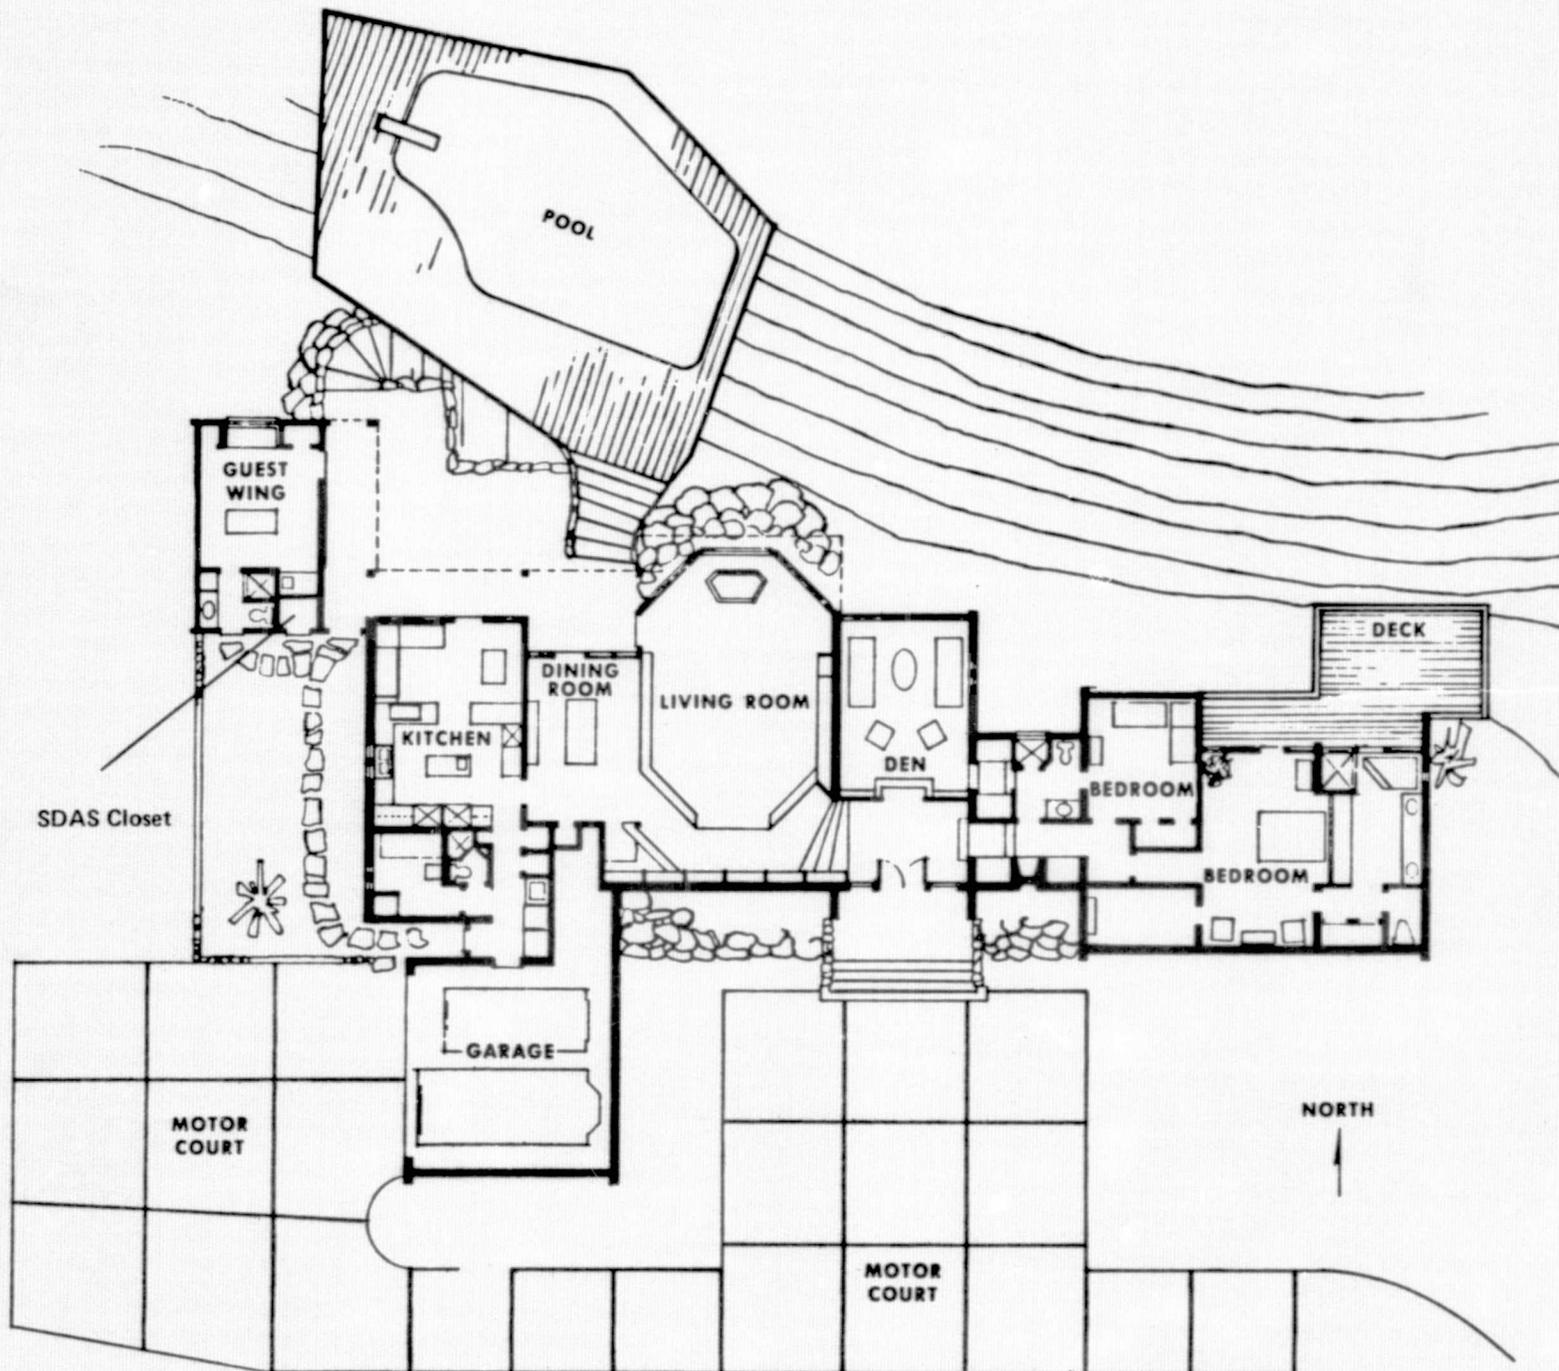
DECADE 80 SOLAR HOUSE FLOOR PLAN SHOWING LOCATION OF SDAS AND JUNCTION BOX.
